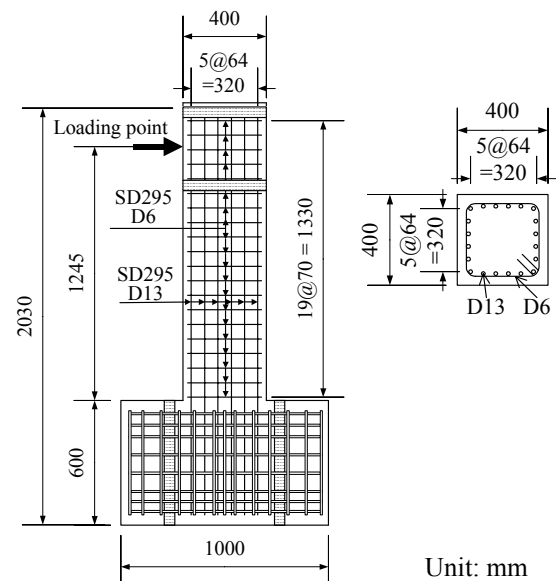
Specimen details and test setup (static reversed cyclic loading test)
